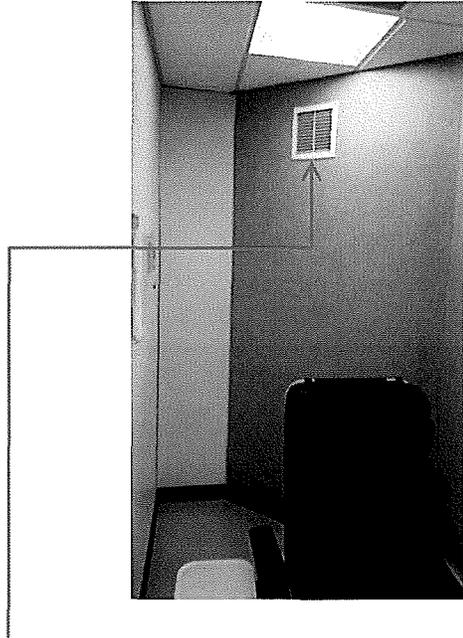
1301 Canal; typical office area supply air duct, mezzanine level, column L2.5.
